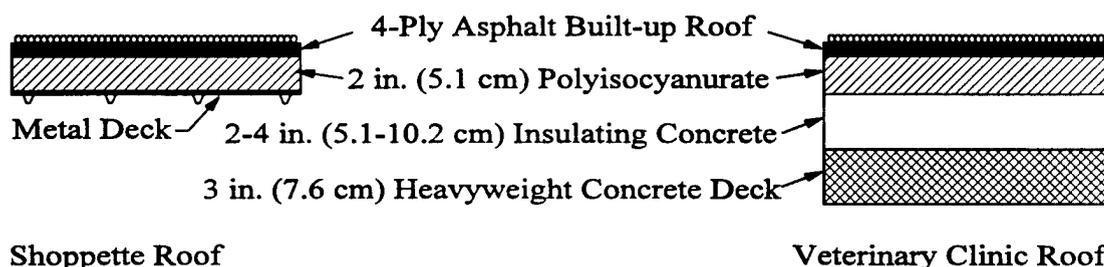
Cross sections of built-up roofs for the Shoppette and the Veterinary Clinic.
